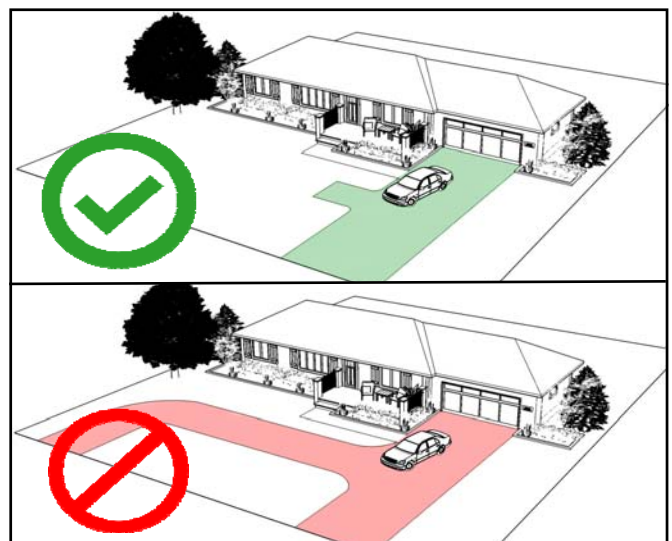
Driveways should have hammerheads for vehicle turn-around rather than circular driveways.
